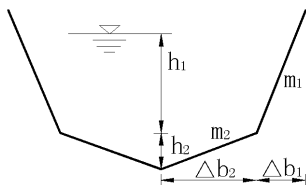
Measurements for the “trapezoid-V” shaped drainage canal
